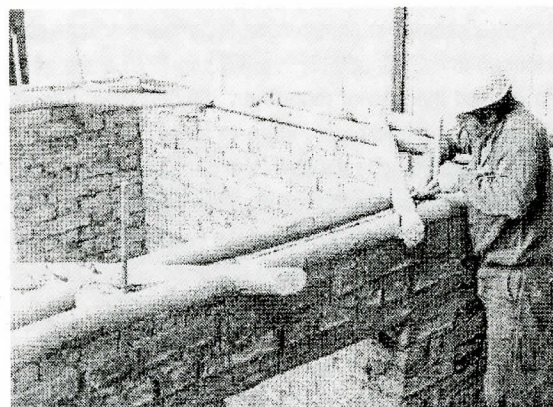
Internal Cane mesh reinforcement in CSEB Construction. Source: Blondet and Aguilar, 2007.
